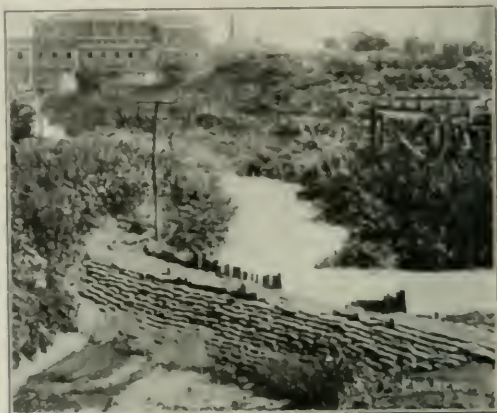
FIRST CONSTRUCTION OF TEMPORARY SAND-BAG DAM ON BEARGRASS CREEK AT LOUISVILLE, KY.
